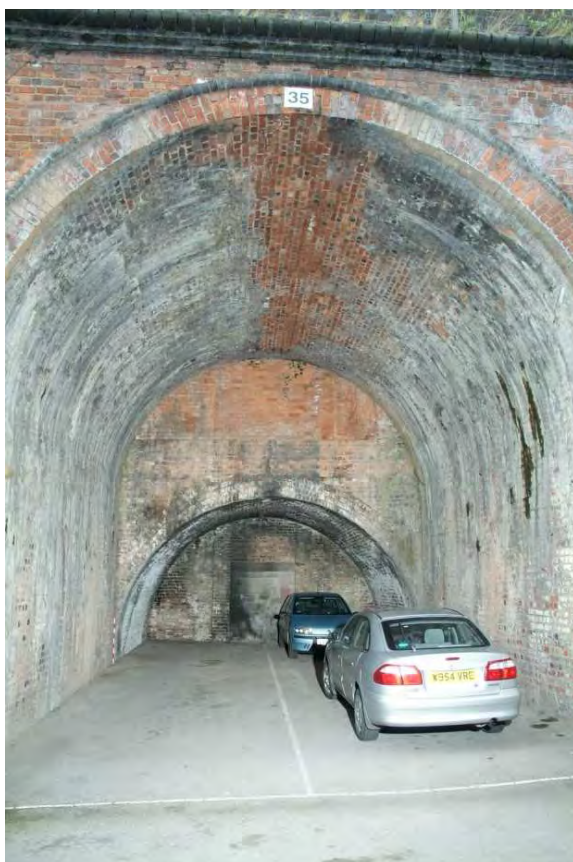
Building 44 – interior of arch No 8 from the east, view to the north
